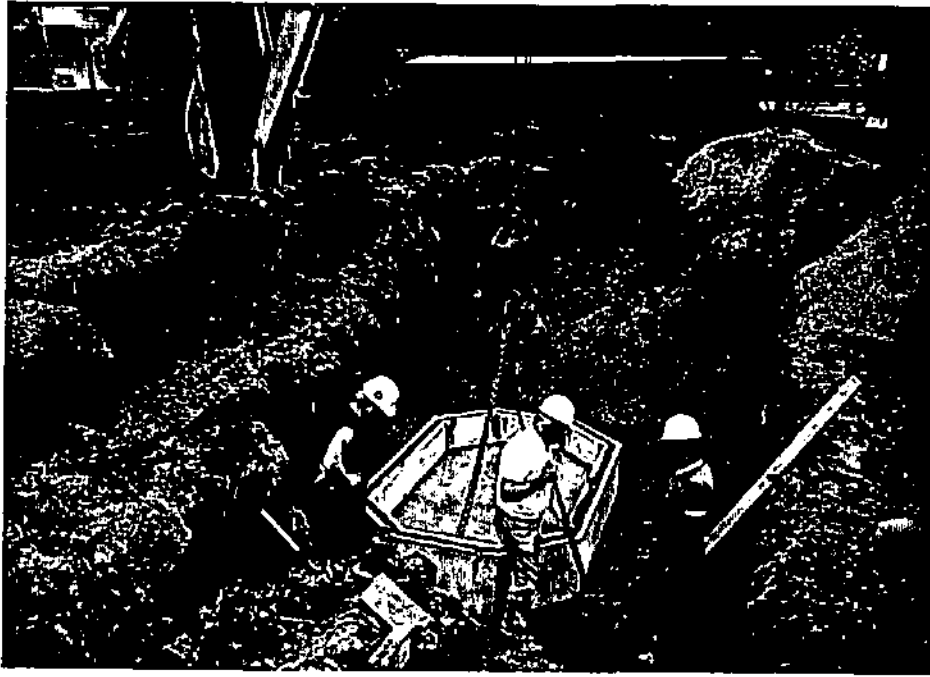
North Bloomfield, N.Y. 7/16/87. A concrete block (base) is being placed in the meter pit at Martin Road.
